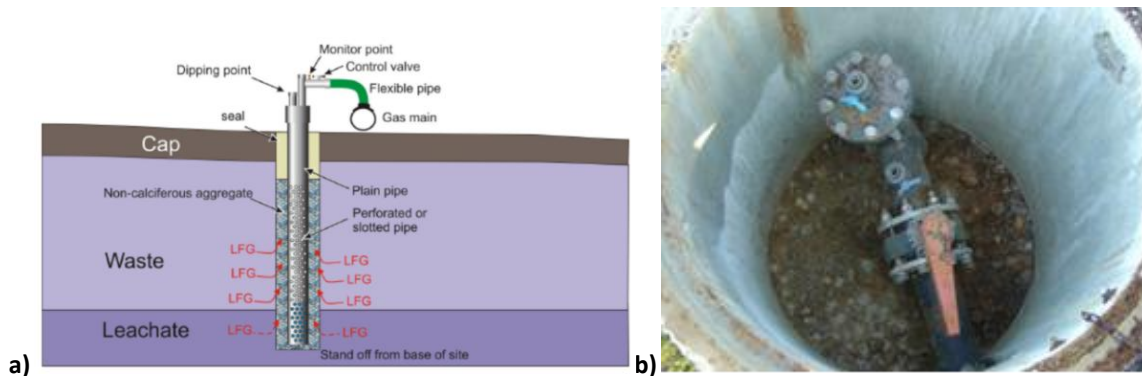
a) Typical gas extraction well scheme and b) representative photo of a wellhead protected by prefabricated concrete pipe.
